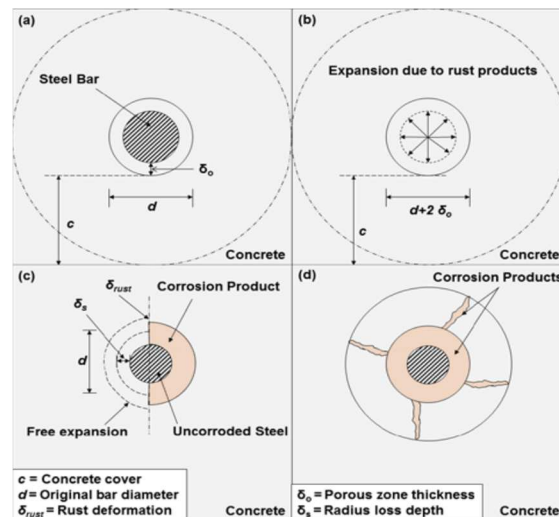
Idealization of concrete cover as a thick-walled cylinder; (a) undamaged rebar embedded in concrete, (b) deformation of concrete due to corrosion expansion, (c) deformation of corrosion products and (d) accumulation of rust into micro cracks and porous region
